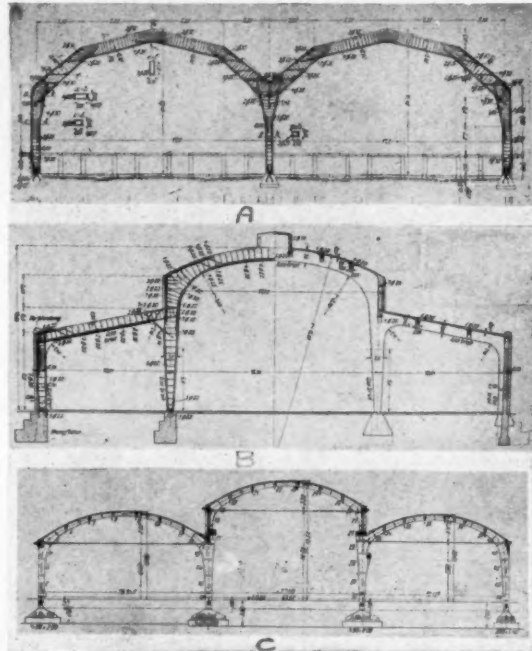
Arrangement of reinforcing steel in typical elastic structures. (A) Trainsheds of Hamburg Elevated Roads. (B) A building in Osnabruck. (C) State machine shops, Sofia.
